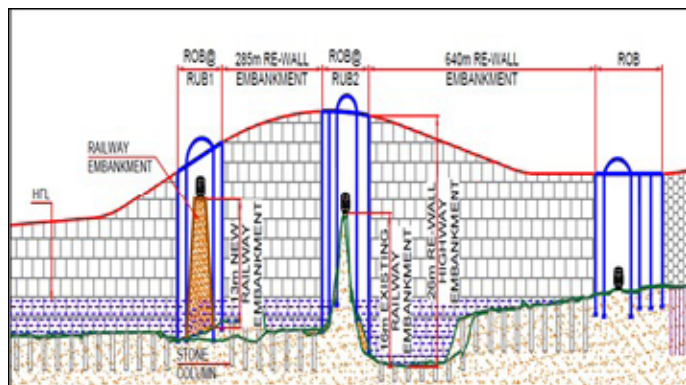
ROB Proposals with RE Wall and Stone Column Ground Improvement Showing Highway Passing over Railway tracks
